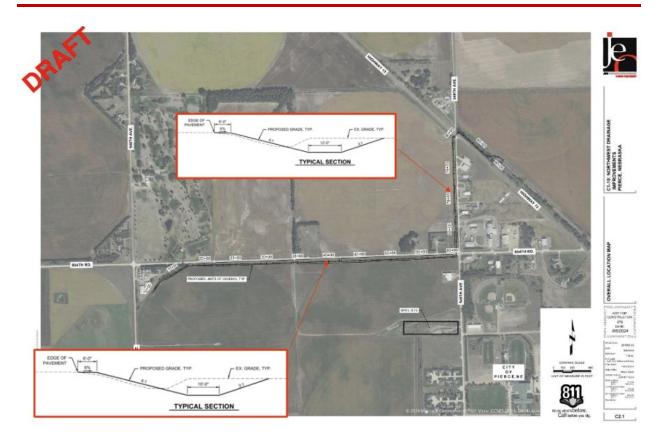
Northwest Drainage Improvements C1-10 Alternative Location
